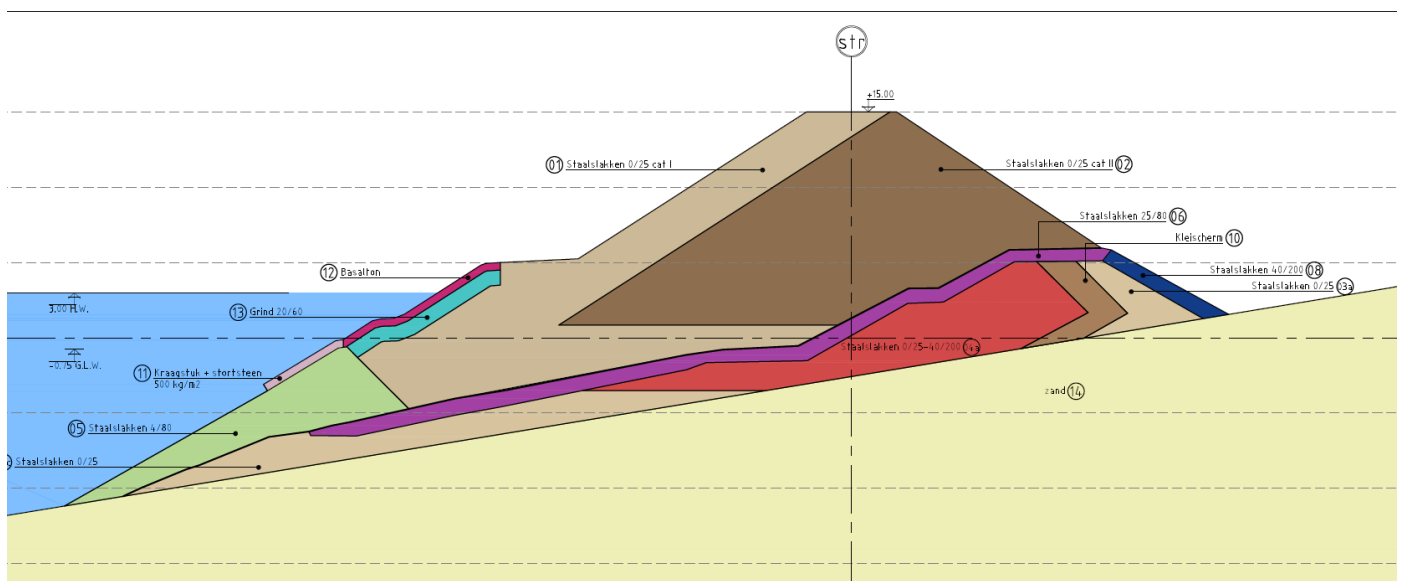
Example of a dike cross-section profile showing the steel slag material layers (Port of Amsterdam, 2023).
